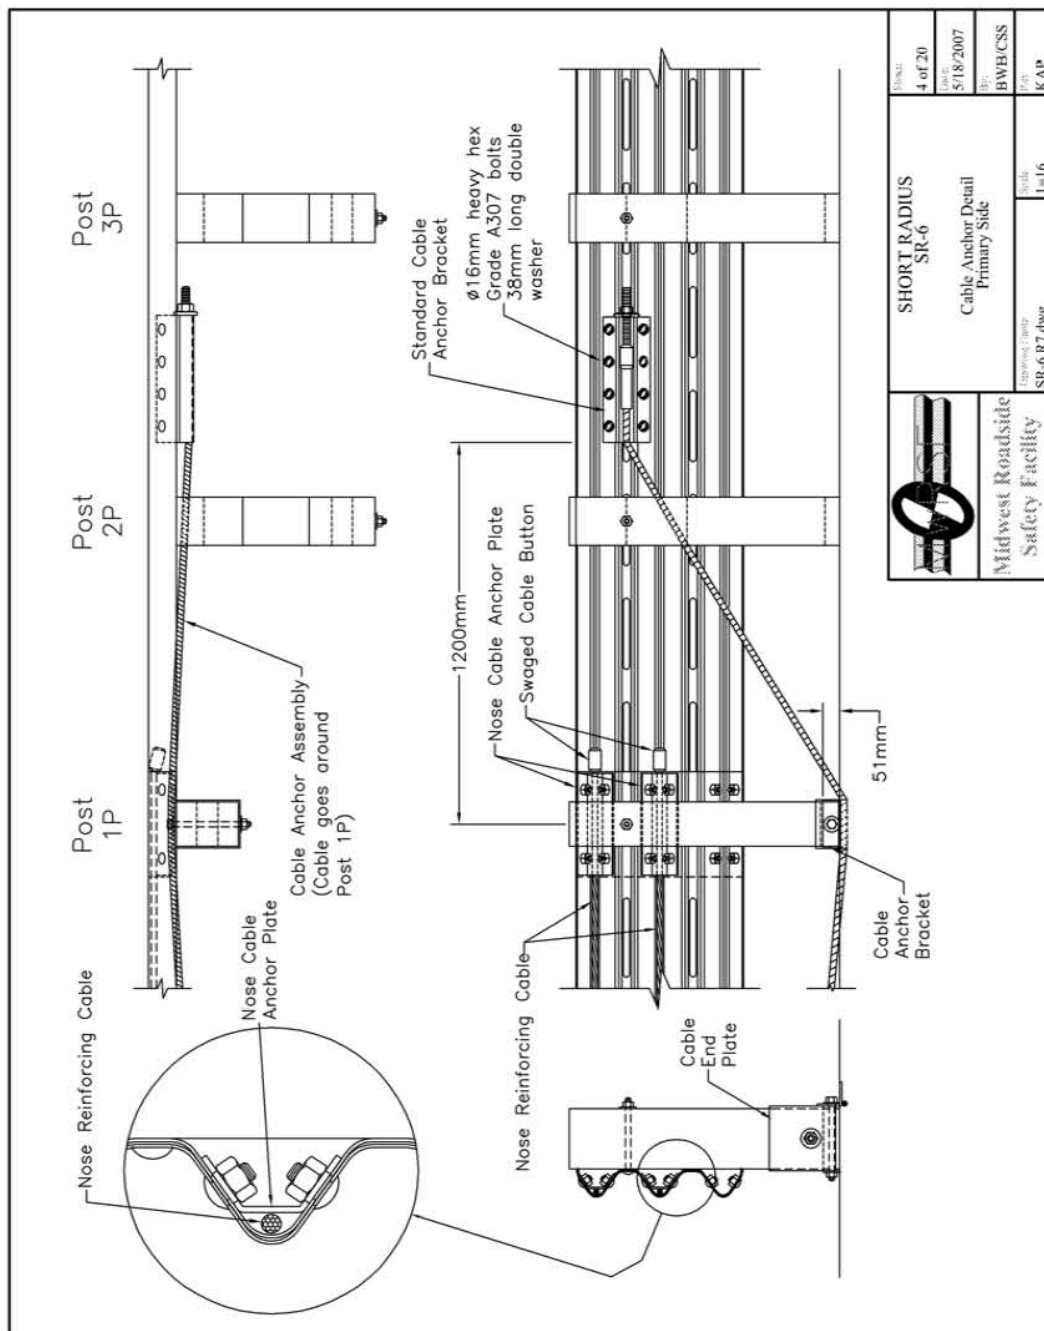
Primary Side End Anchorage Details, Test SR-6
